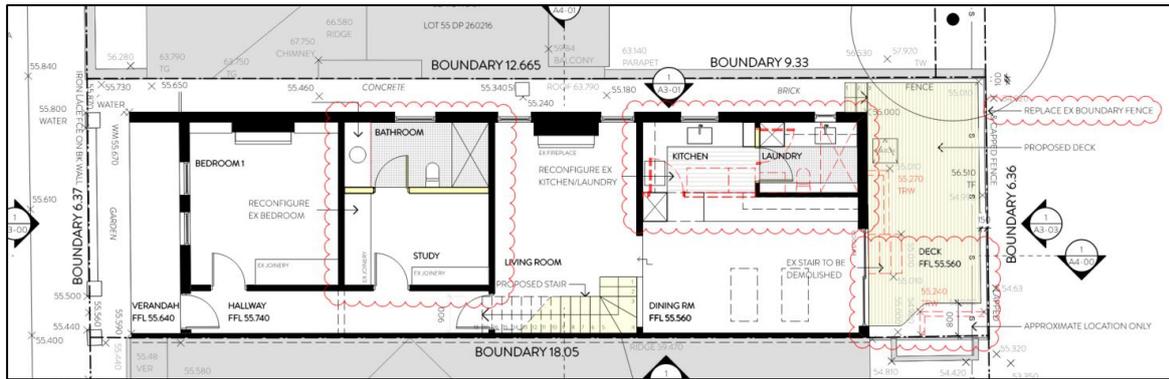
Proposed ground floor plan – 22 Mears Avenue.
